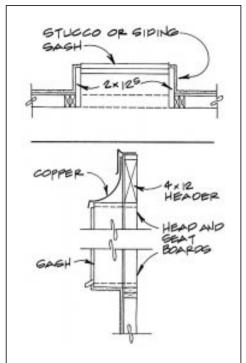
This sitemade "box bay" is framed with 2x12s and uses either fixed glass or manufactured sash in casement or doublehung styles. The roof can be covered with copper or the existing roofing material, or the framing can be butted up under the eaves.
